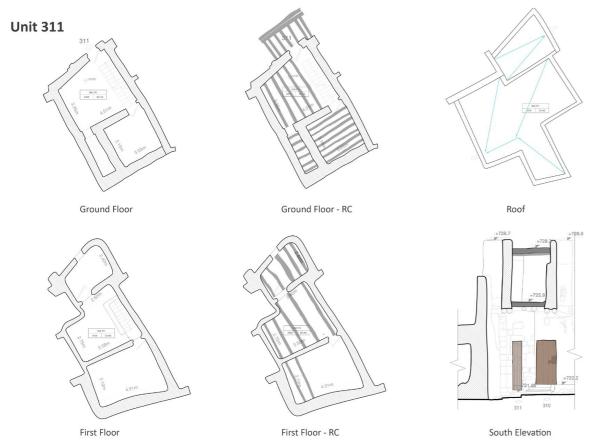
Architectural plans of a typical house in AlUla's Old Town © Author
